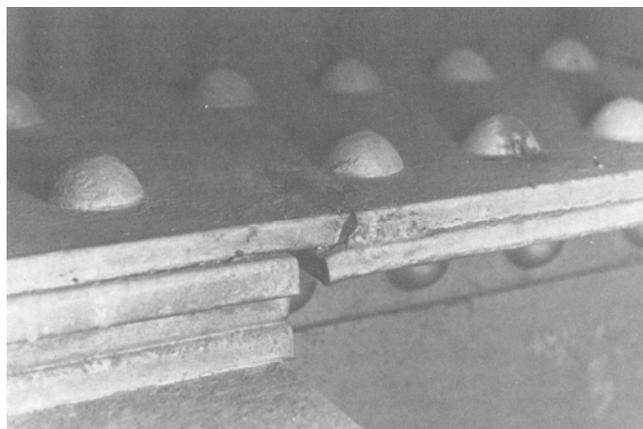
Crack originating at tack weld through tie plate of Lehigh River Bridge (Fisher 1984)
